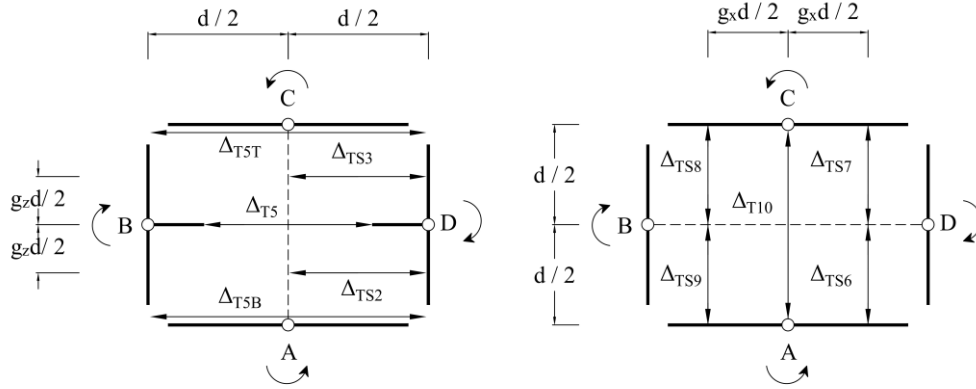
Deformation at the reinforcement location of the exterior joint element
